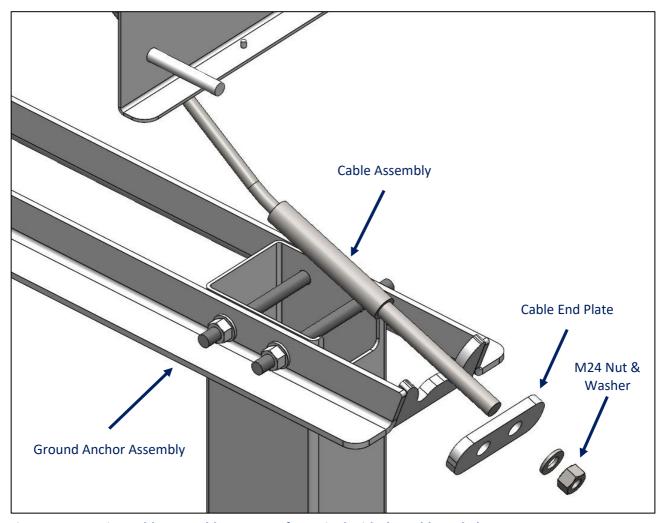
Securing Cable Assembly at Nose of Terminal with the Cable End Plate
